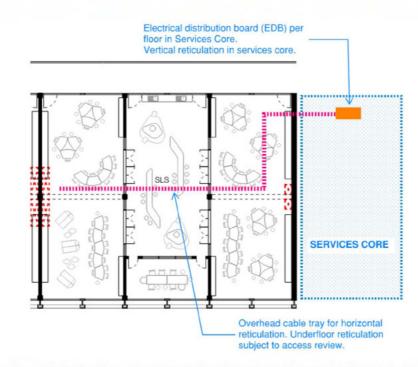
Typical Homebase Vertical and Horizontal Power Cabling Reticulation
